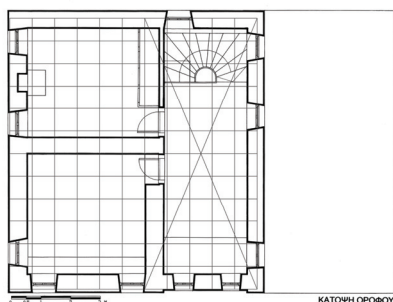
Upper storey plan of Golitsis Mansion in Oxia, Mount Vitsi
